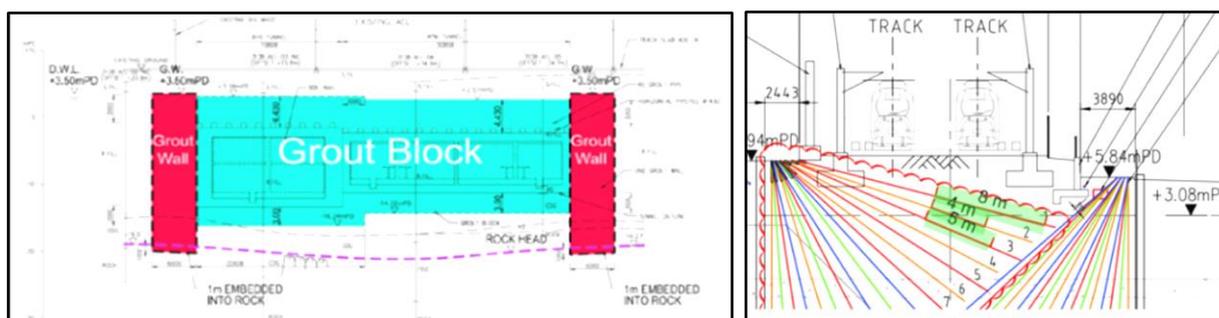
a) Cross section Grout Walls and GBUAEL; b) Typical Fan Grouting Section under AEL
